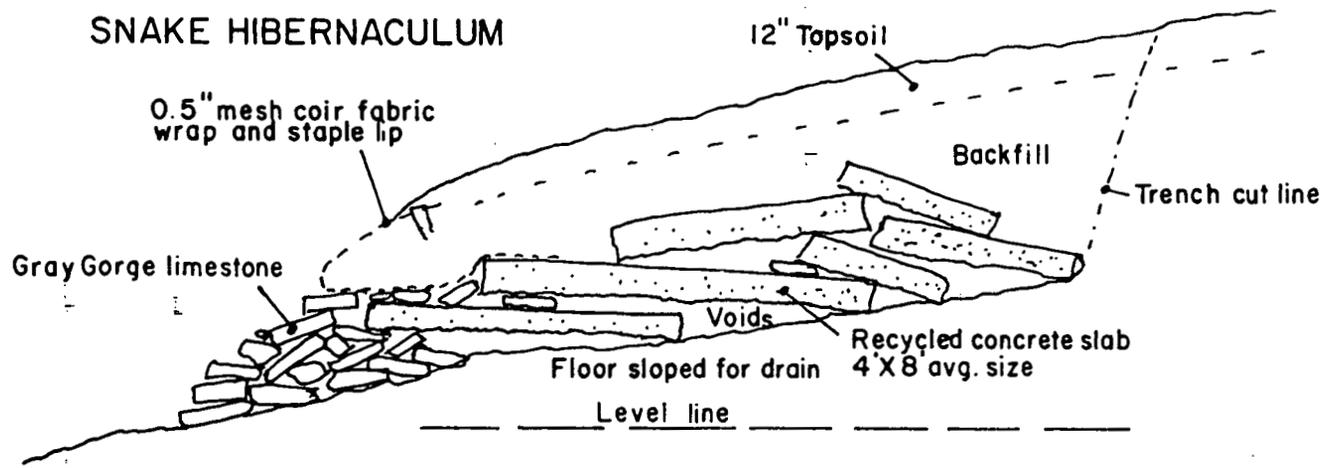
A snake hibernaculum is proposed. The structure is designed as a series of random and wedge-shaped voids and with no main entrance tunnel. Care must be taken during construction to avoid filling in cracks between stones of the entrance area.
